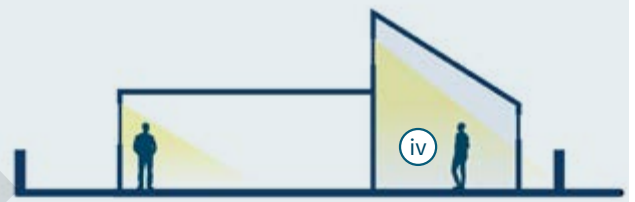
Raked ceilings with windows can provide spaciousness, daylight and sky views in spaces with confined outlook.
